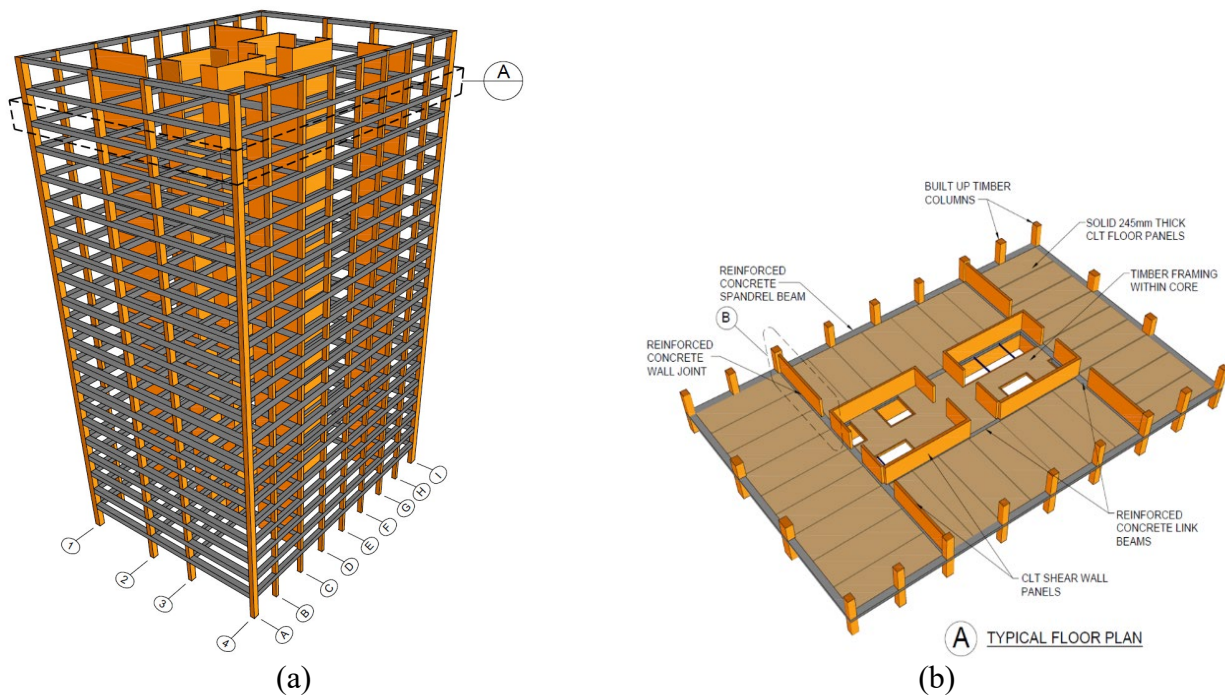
RC-timber hybrid building, a) 3D perspective, and b) typical floor layout
